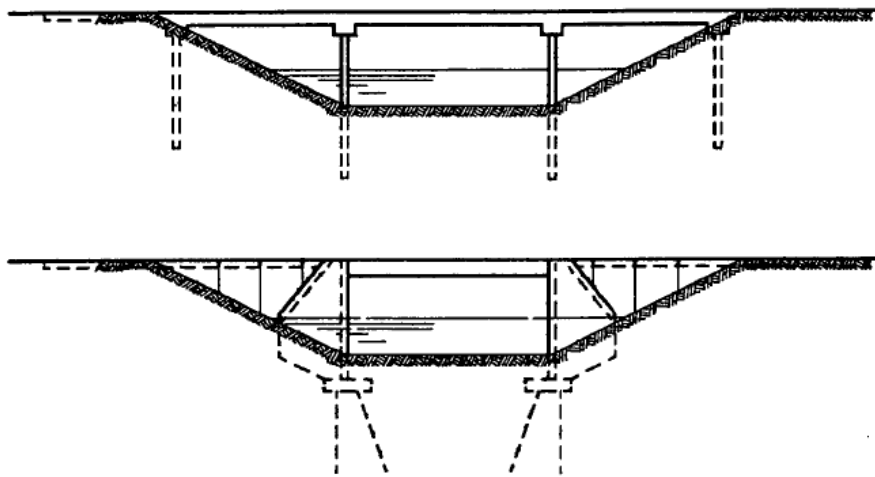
Integral bridges with single span (bottom) and multiple spans (top). Source: Burke (1993)
